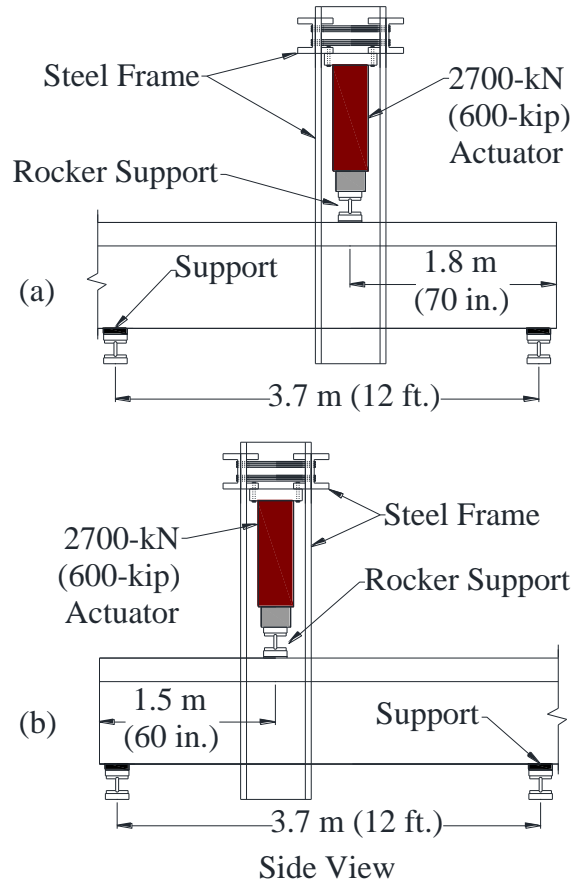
Side View of Shear Test Setup: (a) Shear Test 1 and (b) Shear Test 2.
